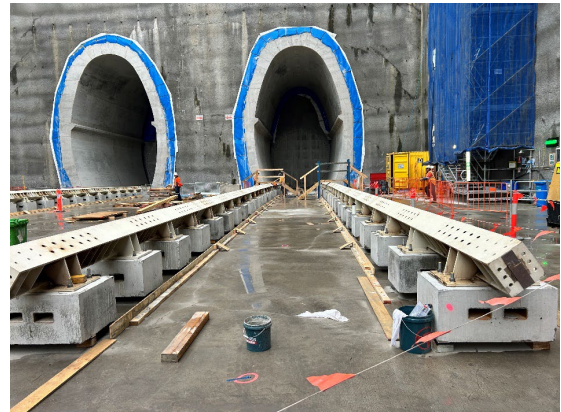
SOP Site – tunnel portal with TBM tracks
